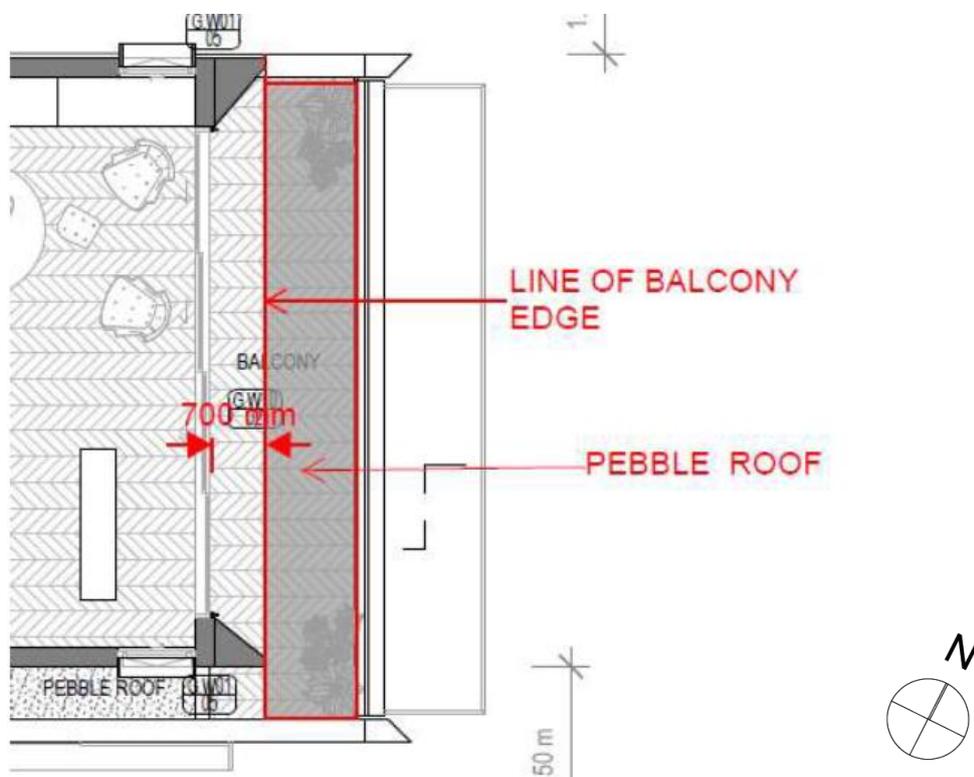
Excerpt of proposed level 2 floor plan, depicting applicant's requested modification to the eastern elevation balcony.
